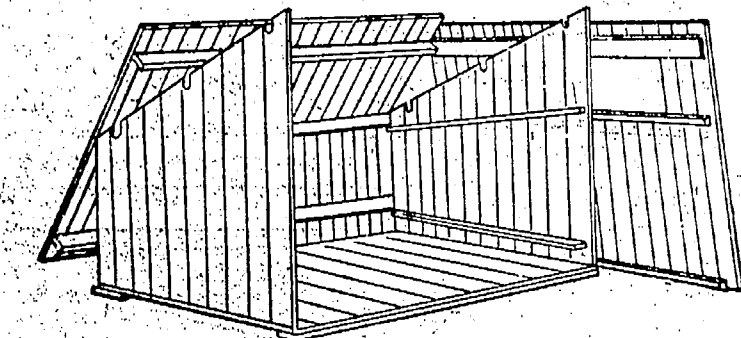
Hog cot with upright walls and shed roof, taken down.
